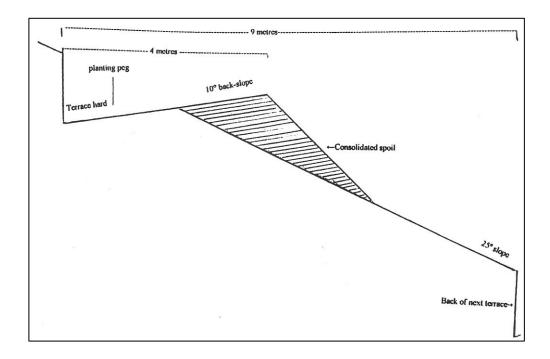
Diagram of planting terrace construction (after Turner& Gillbanks, 2003)
